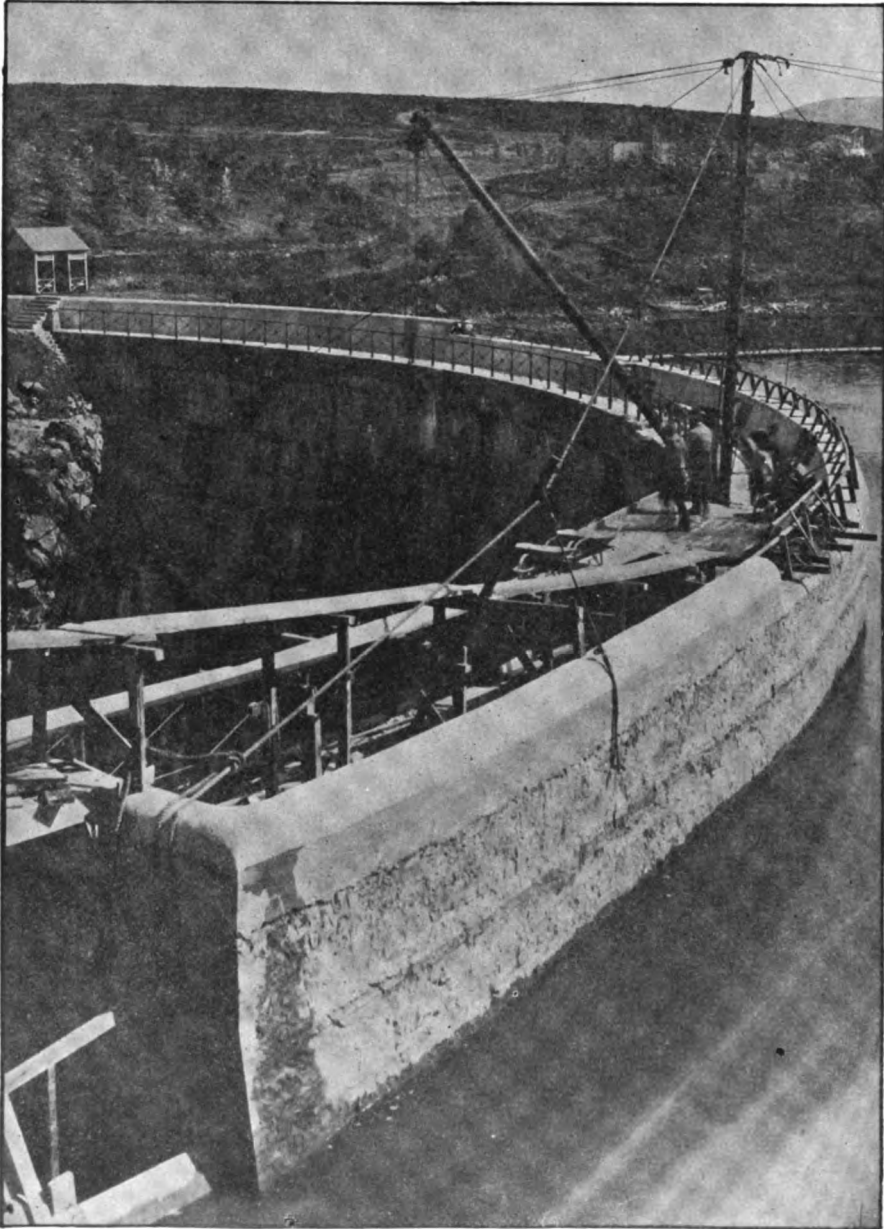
REPAIRING AND INCREASING THE HEIGHT OF THE PARAPET OF SWEET-WATER DAM.
